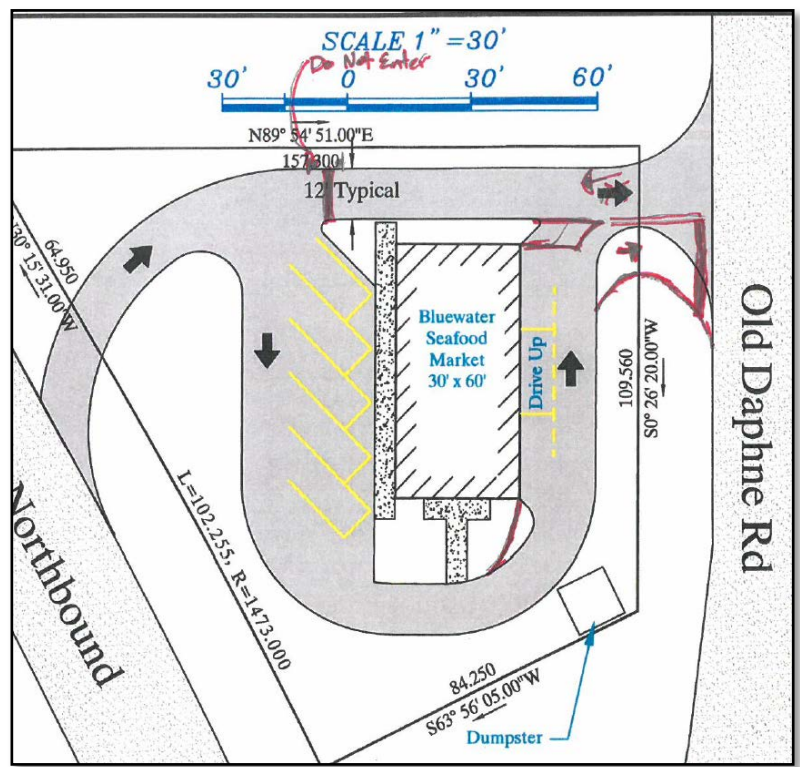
Traffic Engineer's Suggested Revisions to Original Plan
